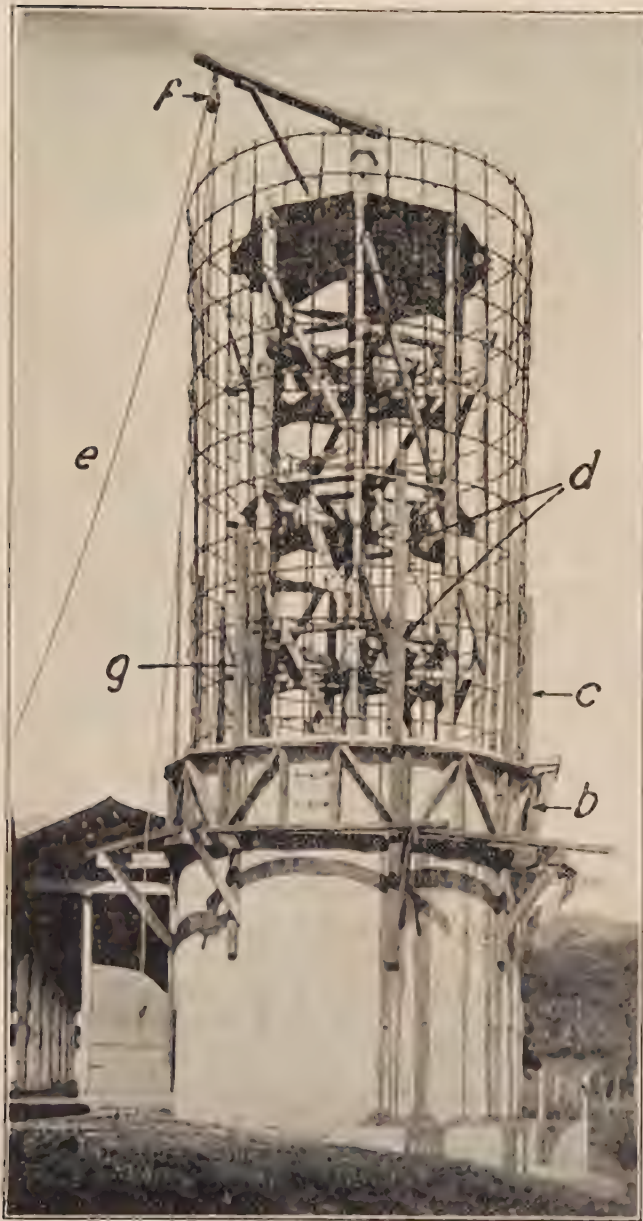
A silo form in position: (b) outside form; (c) board to hold the forms in place; (d) slots on the board; (f) pulley; (e) hoisting rope.
